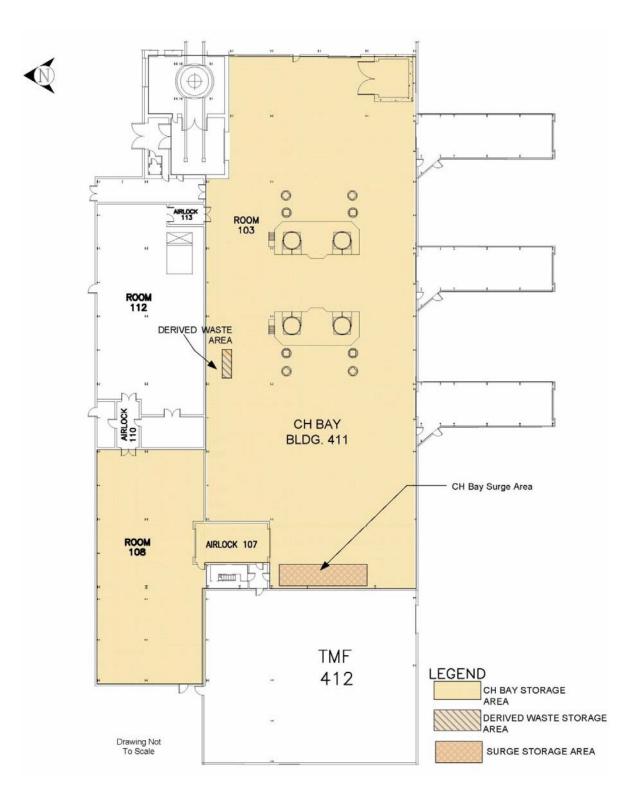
Waste Handling Building - CH TRU Mixed Waste Container Storage and Surge Areas
